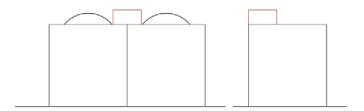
Reusing the house's roof and providing suitable proportions and qualities for the roof pergolas
